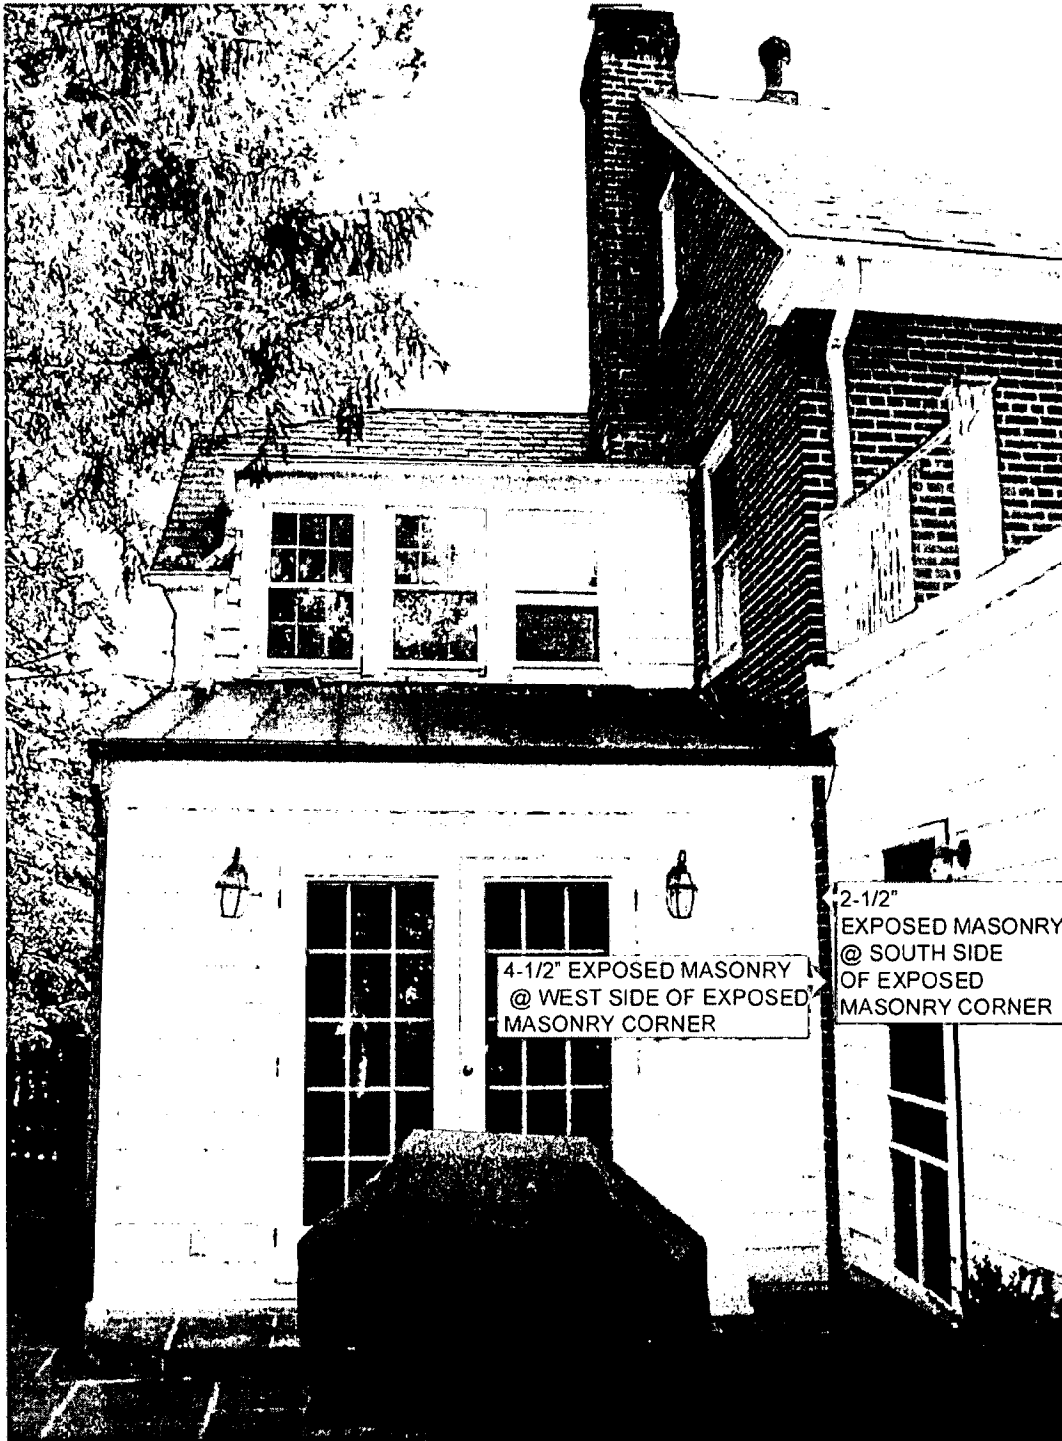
PHOTO - EXISTING SOUTHWEST CORNER OF HOUSE MASSING (MASONRY PORTION)
